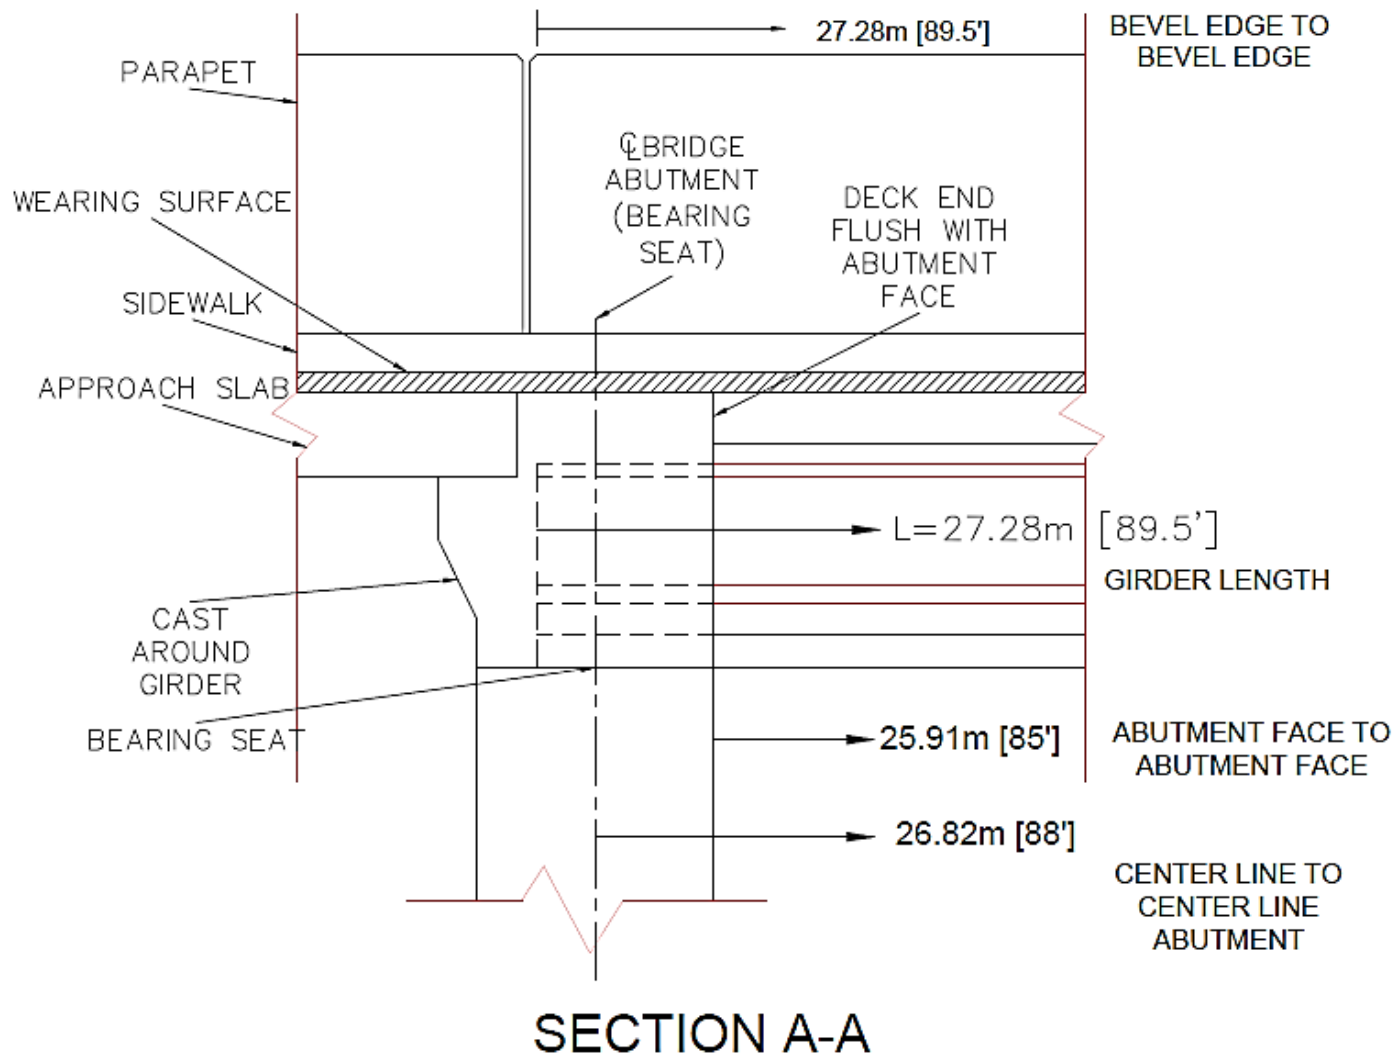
End Section of the Bridge, Section AA from Figure 2.4
